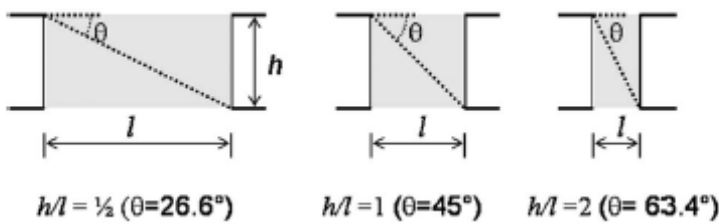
Wall pier geometry and critical crack angles (Wallace et al., 2008).
